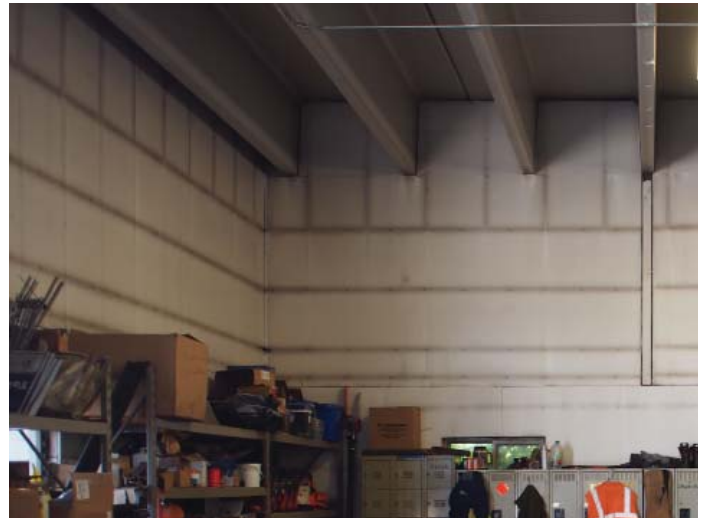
Evidence of thermal bridging throughout the building as dirt has accumulated at areas of condensation aligning with the studs
